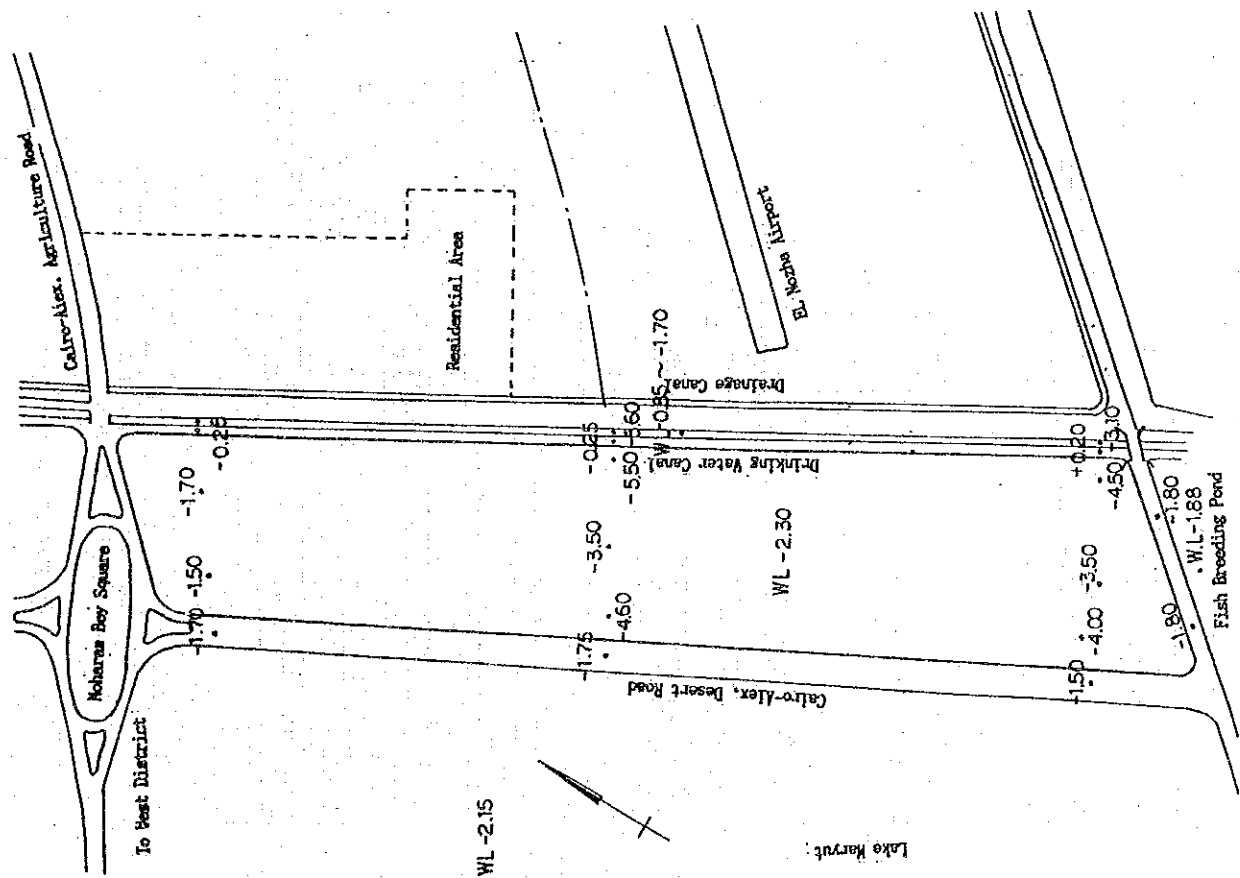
ELEVATION IN AND AROUND MBSDS
